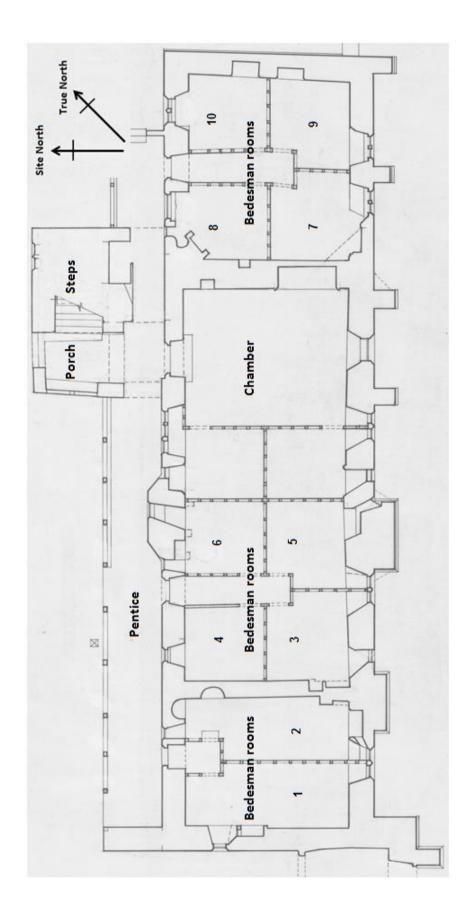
Ground-floor plan of the Bede House (after HBMC 1986)
